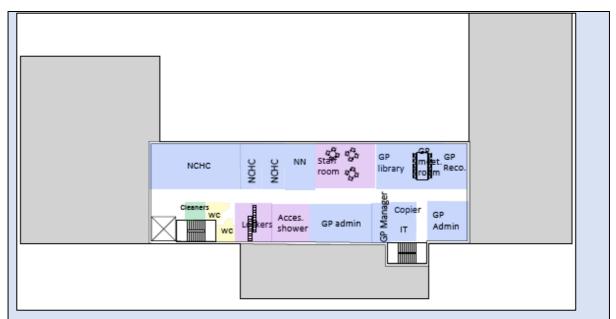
Sprowston proposed Hub - Option 3 Indicative First Floor Plan
